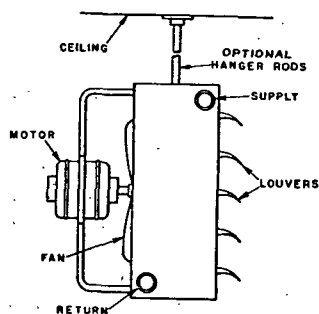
PROPELLER FAN TYPE UNIT HEATER—HORIZONTAL BLOW
